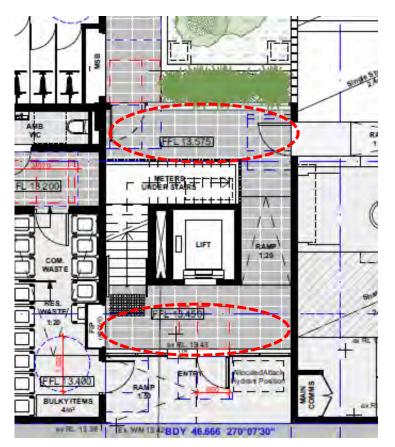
Ground Level Plan showing additional areas highlighted that should be included as GFA.
